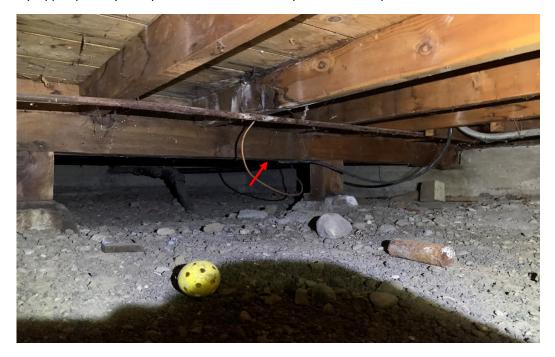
Below the kitchen, there was evidence of prior or current moisture exposure damage to framing and sheathing. The beam was visibly deflecting (red) along its span.
